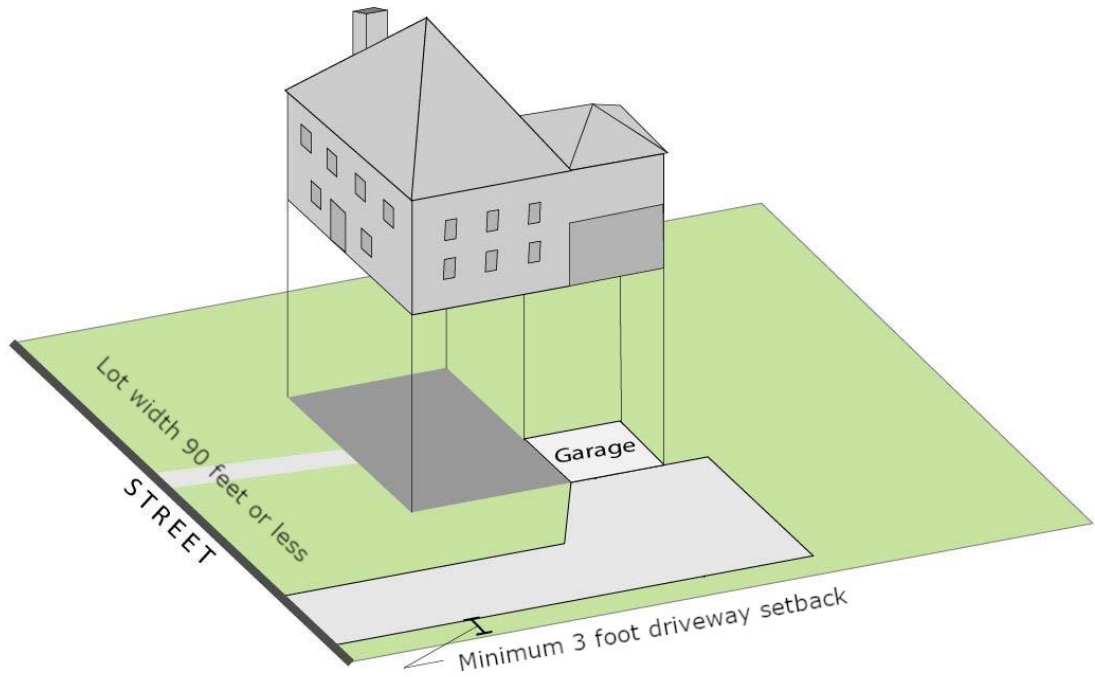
C – Side-Entry Garage Driveway Width for Lot Width 80 Feet or Less
